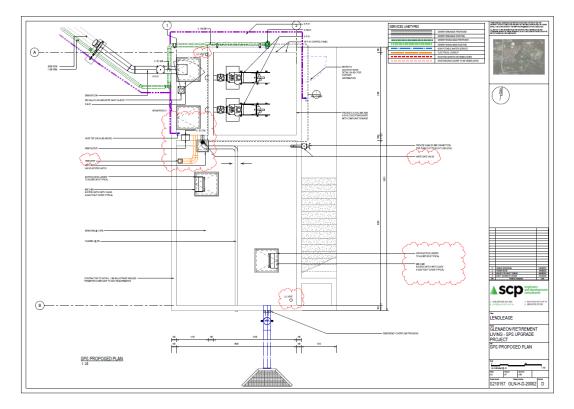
Site Plan by SCP showing the Sewerage pumping station location
